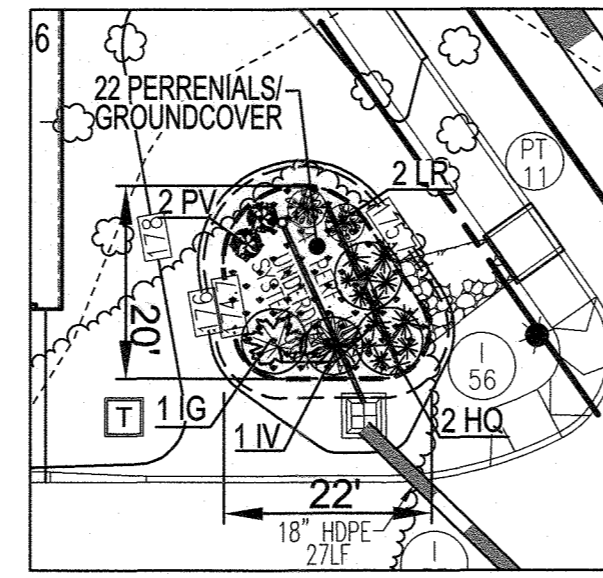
DETAILED BIO AND PLANTING PLAN (SWM #20)
